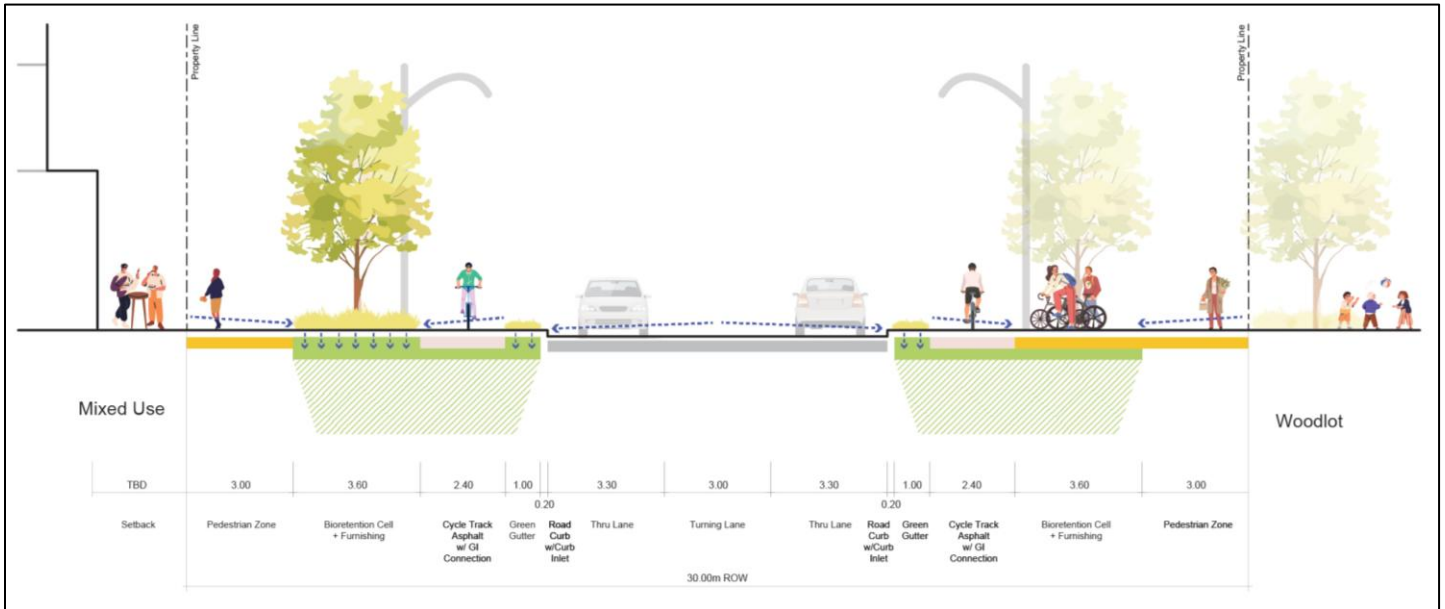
Northern Street (Keele Street to Sheppard Avenue West) Cross-Section – Option 1
